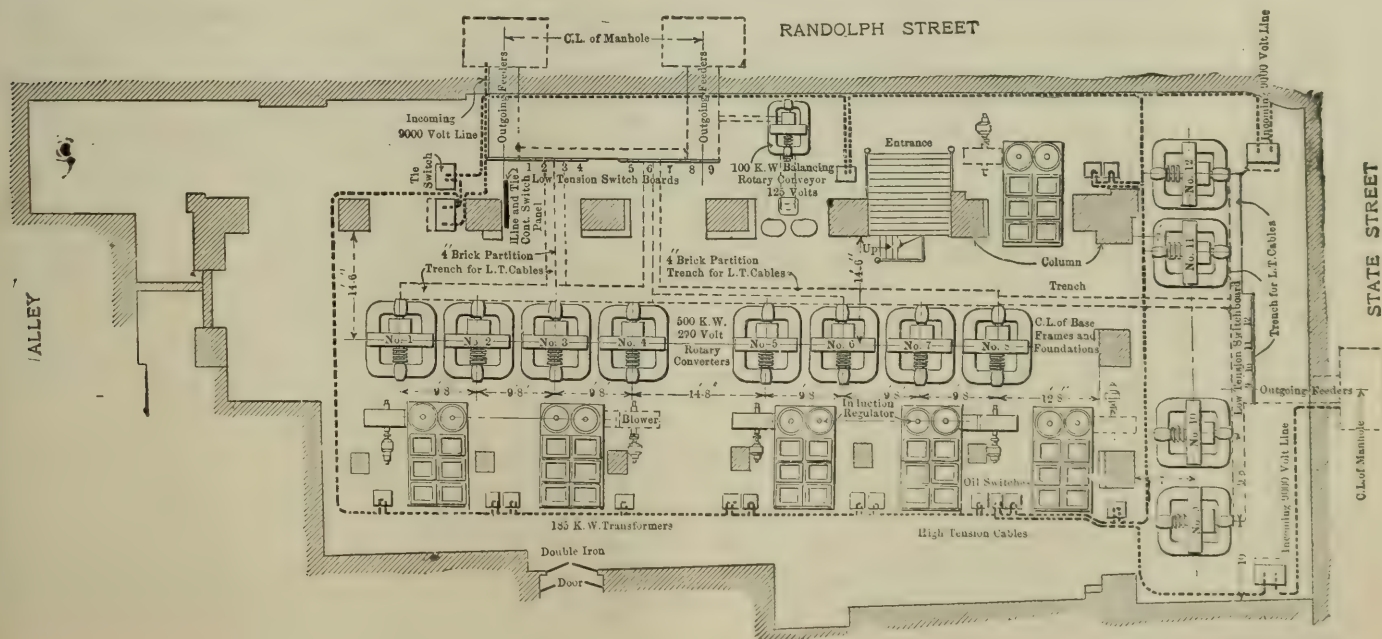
GENERAL PLAN OF RANDOLPH STREET SUB-STATION.
